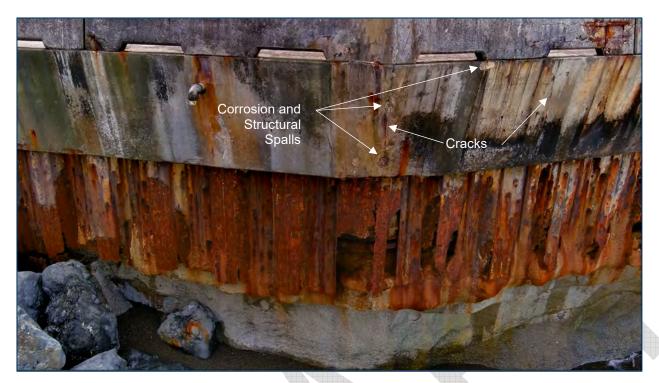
Pier Abutment, Handrail and Concrete Cap – North Face
